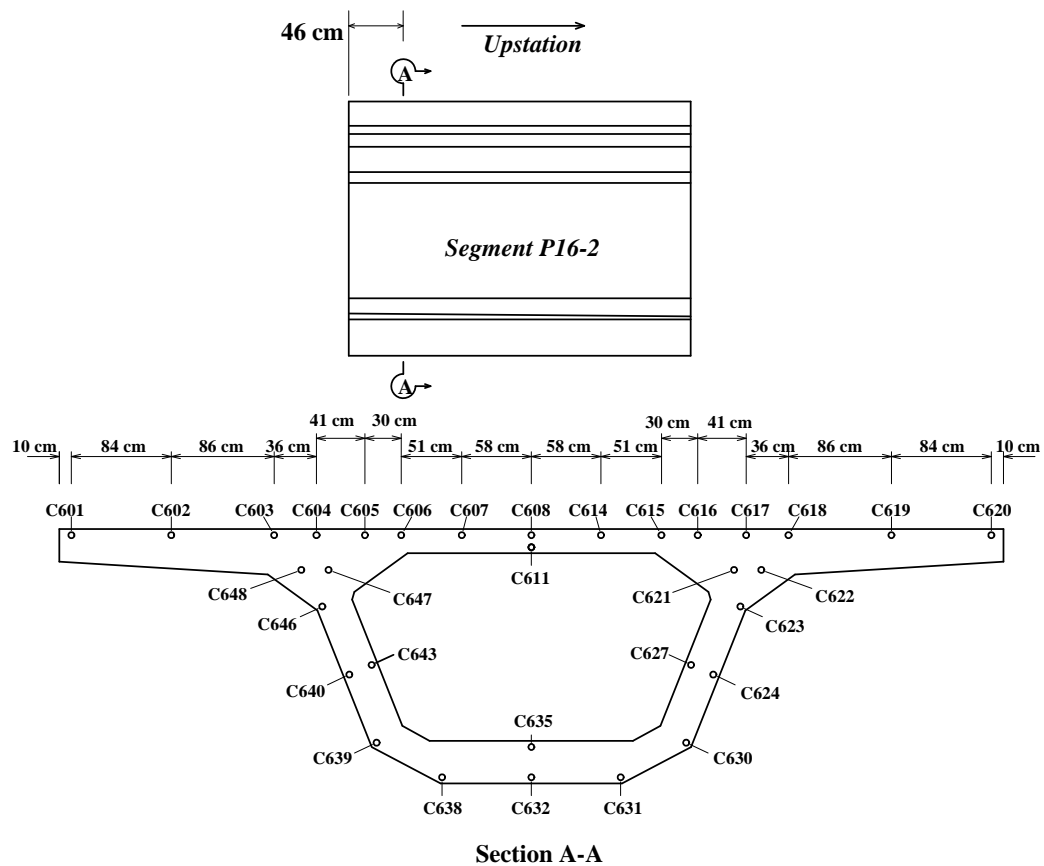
Locations of the instrumented sections in Ramp P
